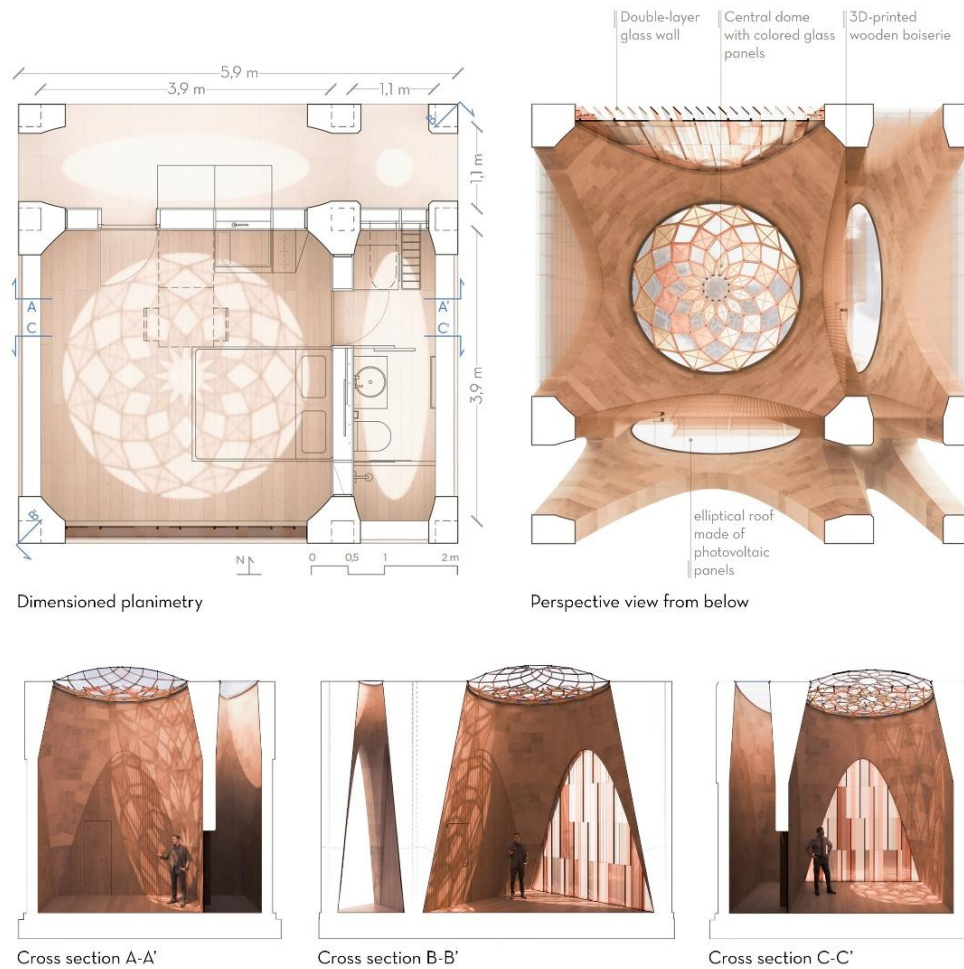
Technical Drawings: A Dimensioned Planimetry, a Perspective View from Below and Three Cross Sections
